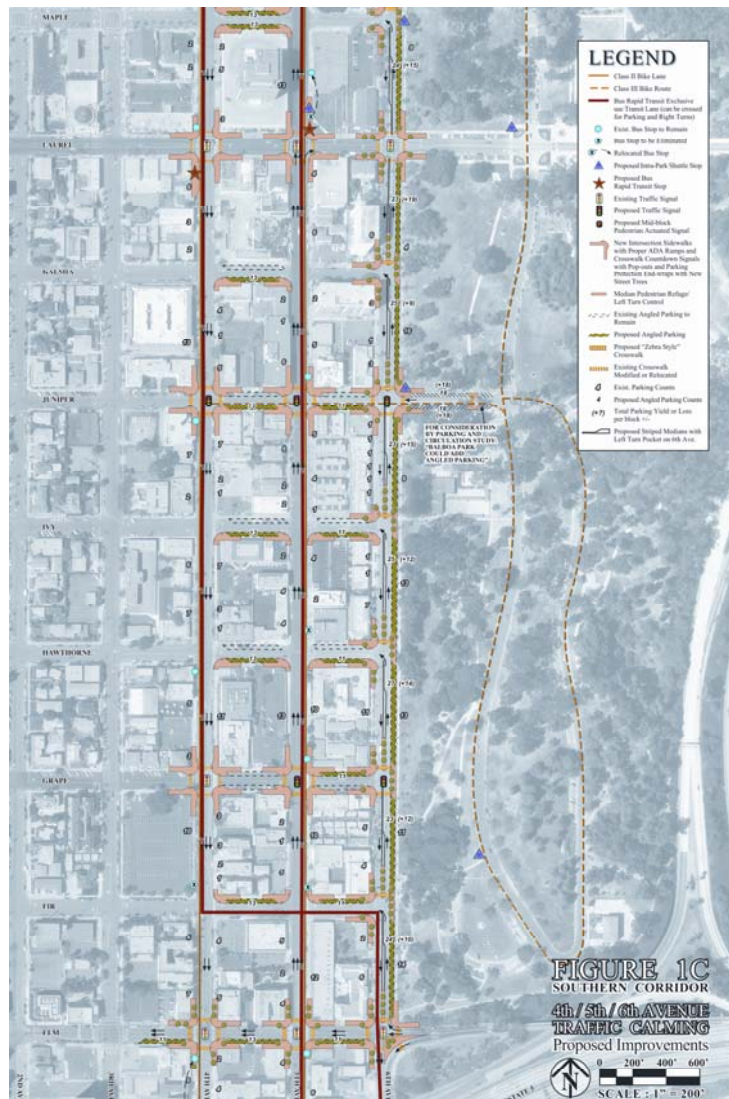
2005 Concept Plan – Southern Corridor
